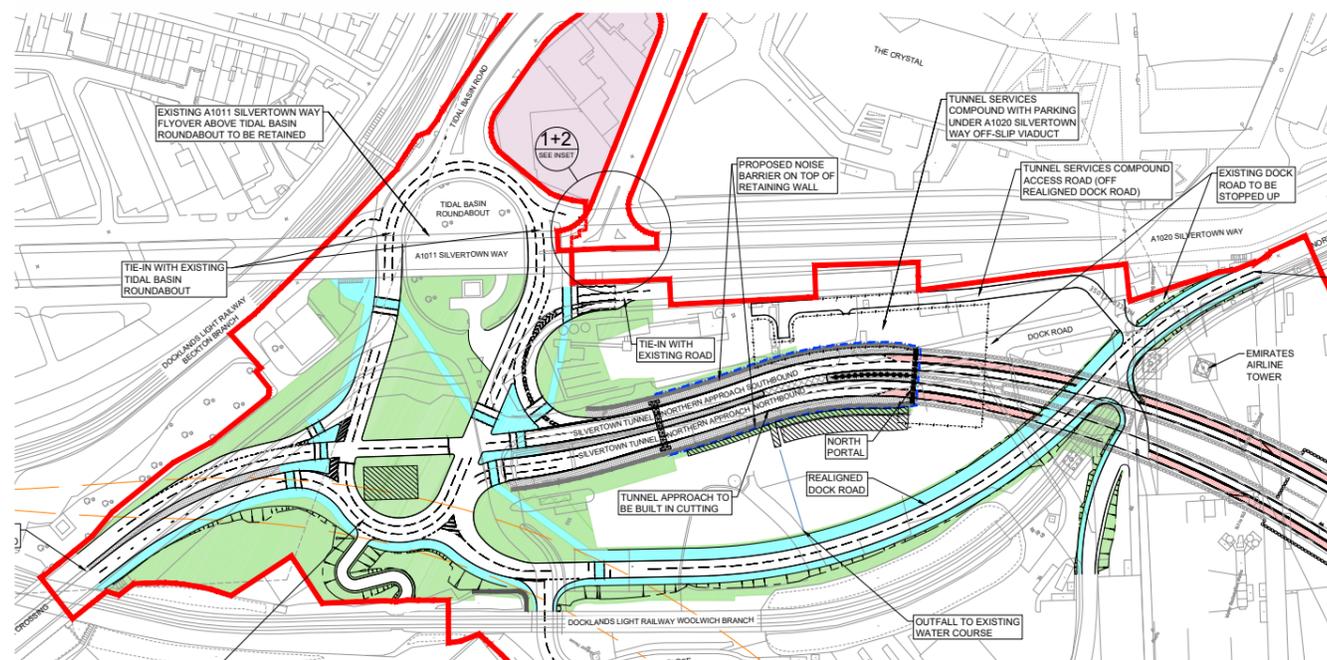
DCO application 2.2 General Arrangement Plans (ST150030-PLN-ZZZ-ZZ-DSD-ZZ-0093)
